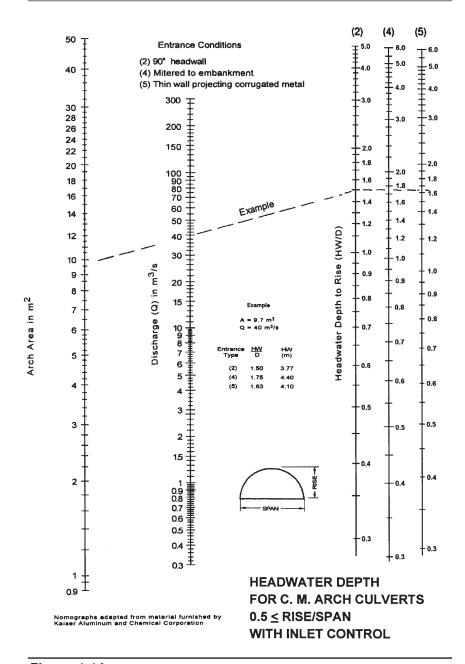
Headwater depth for structural plate corrugated steel arch with $0.5 \le rise/span$, under inlet control.
